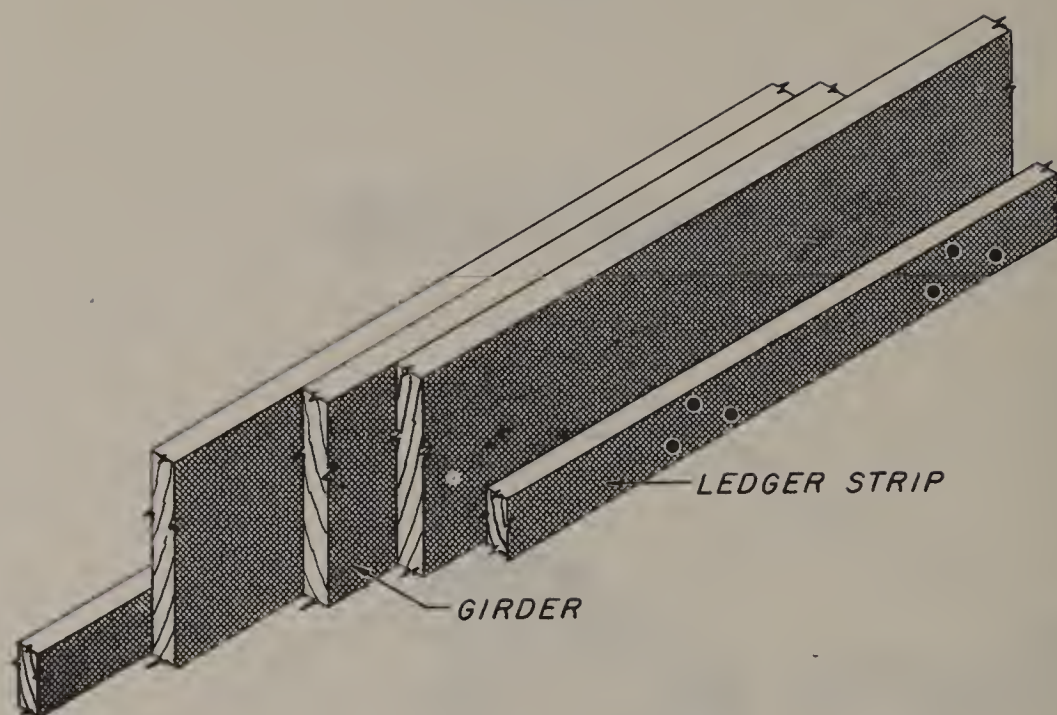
Ledger. Nailed to girder with three twentypenny nails near each joist position. Note: This nailing will safely support a concentrated load of 300 pounds at any point on the floor, or a uniformly distributed load of 50 pounds per square foot over any joist span and spacing ordinarily used in small house construction.
